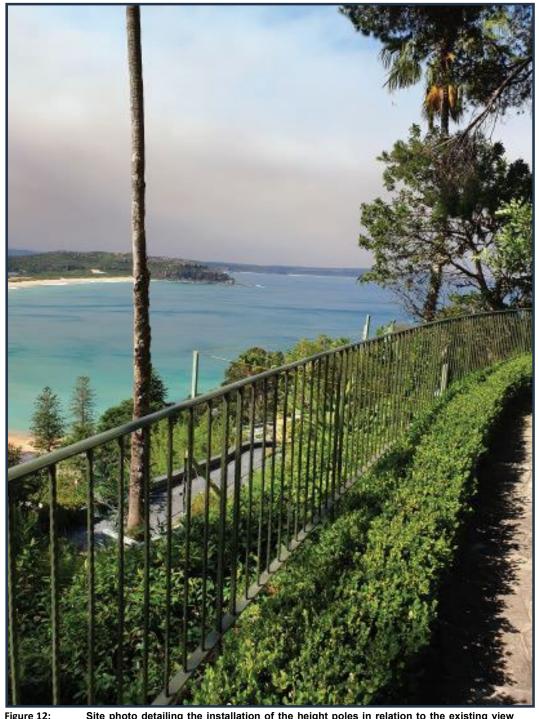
Site photo detailing the installation of the height poles in relation to the existing view (Source: Stephen Lesiuk Architect)
